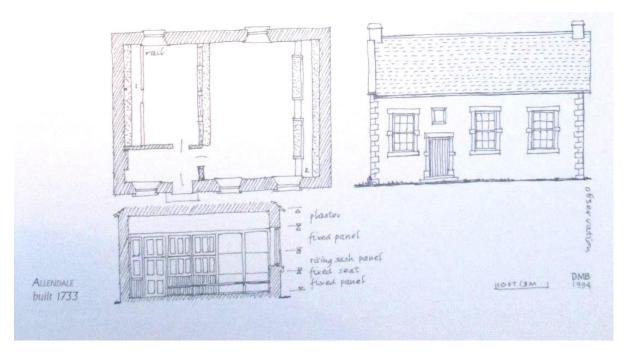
Plan, elevation and section, from Butler, 1999, Vol.1, p. 475
